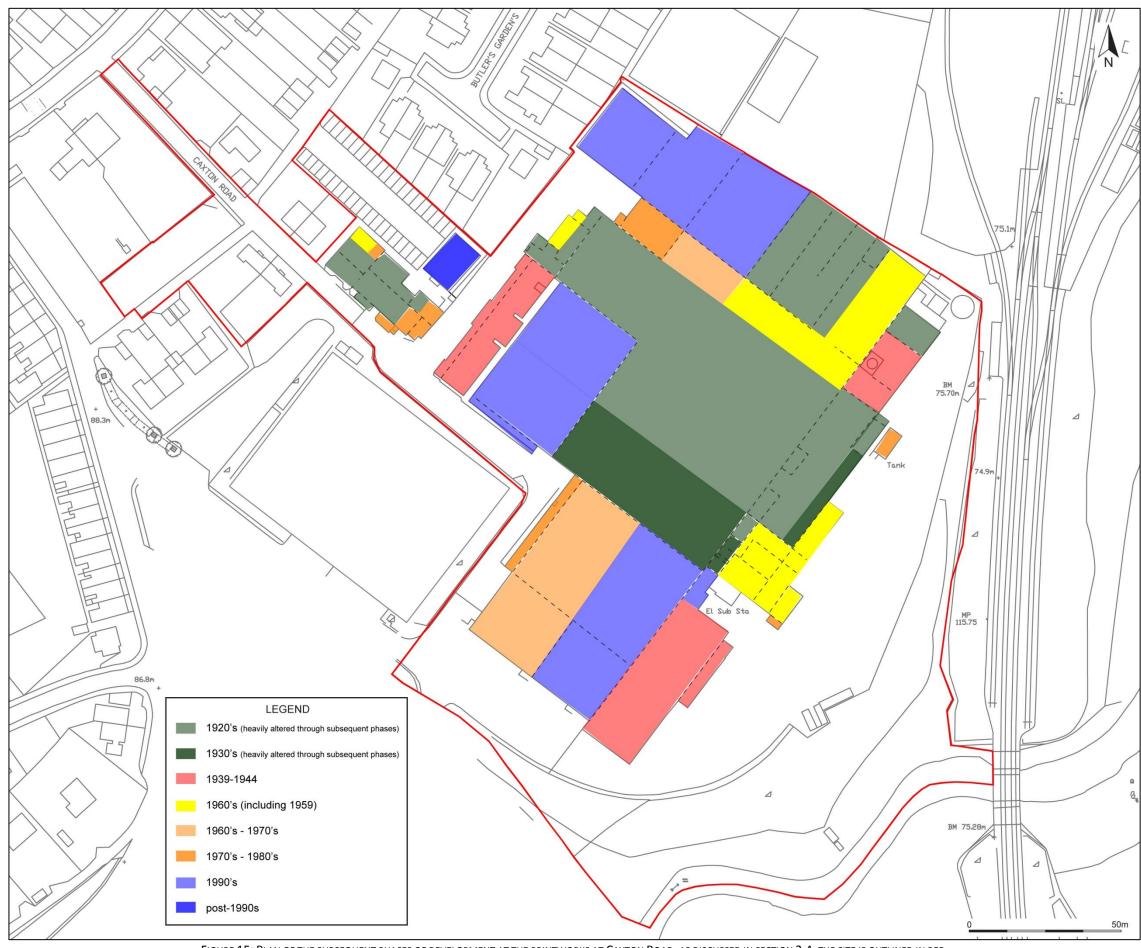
PLAN OF THE SUBSEQUENT PHASES OF DEVELOPMENT AT THE PRINTWORKS AT CAXTON ROAD, AS DISCUSSED IN SECTION 2.4; THE SITE IS OUTLINED IN RED.
